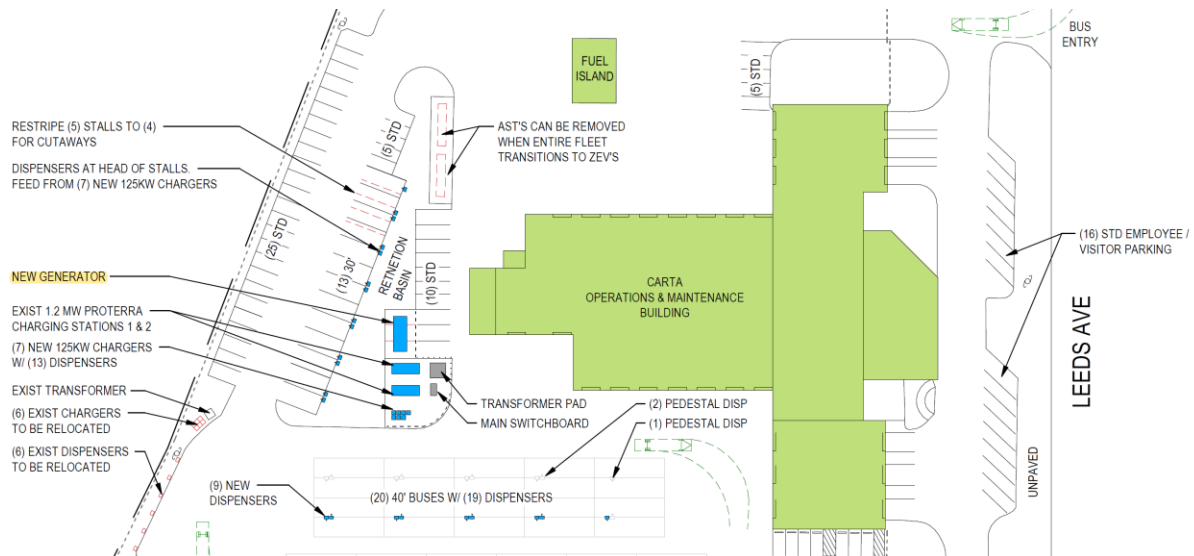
Proposed generator location in the site concept plan for the Leeds Ave facility
